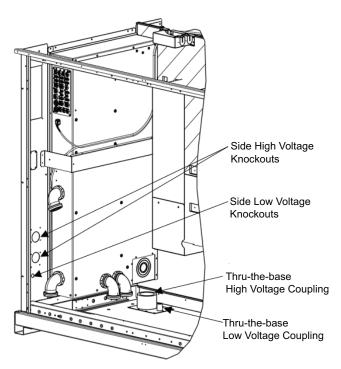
Basepan Coupling Locations and Side Knockouts for Power and Control Wiring
